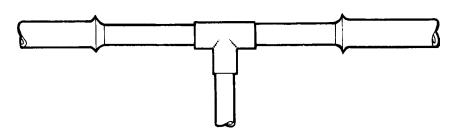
Method of branching a copper pipe into an existing lead gas pipe
